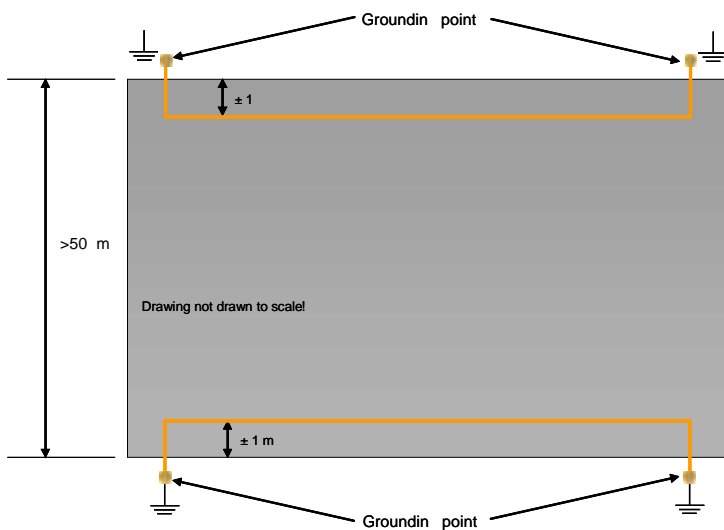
Copper strip layout for rooms > 50 m<sup>2</sup>, alternative B
